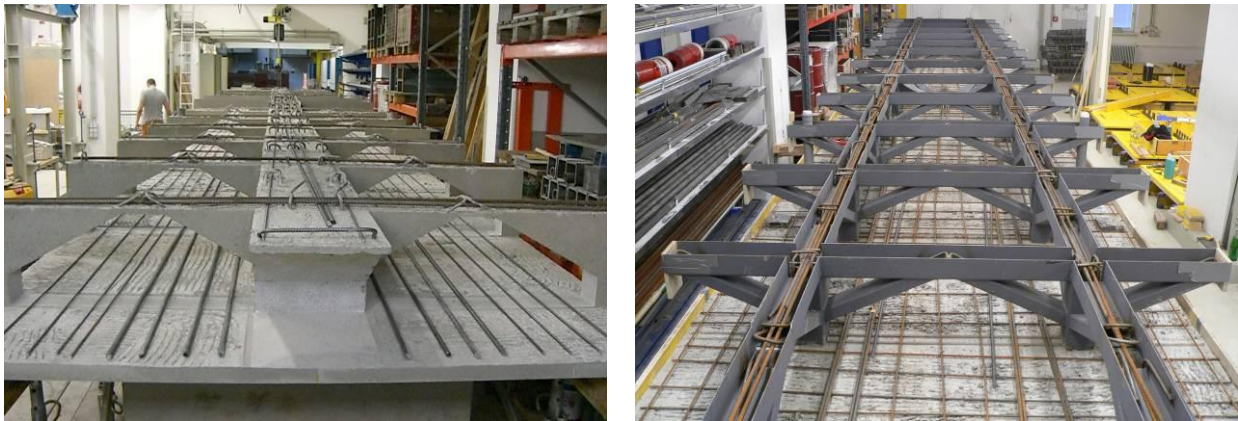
Prefabricated elements of specimen 1 (left) and 2 (right) before casting with concrete
